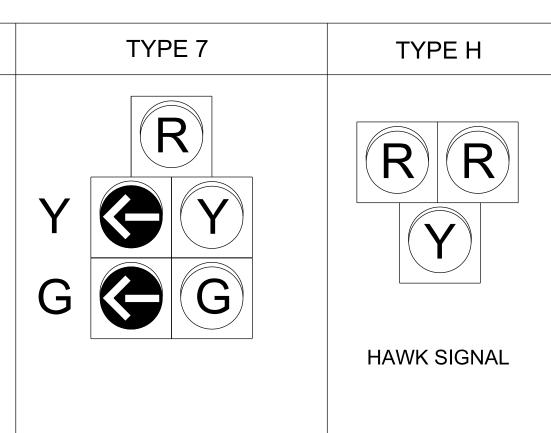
# DETAIL OF TYPICAL TRAFFIC SIGNAL HEADS
